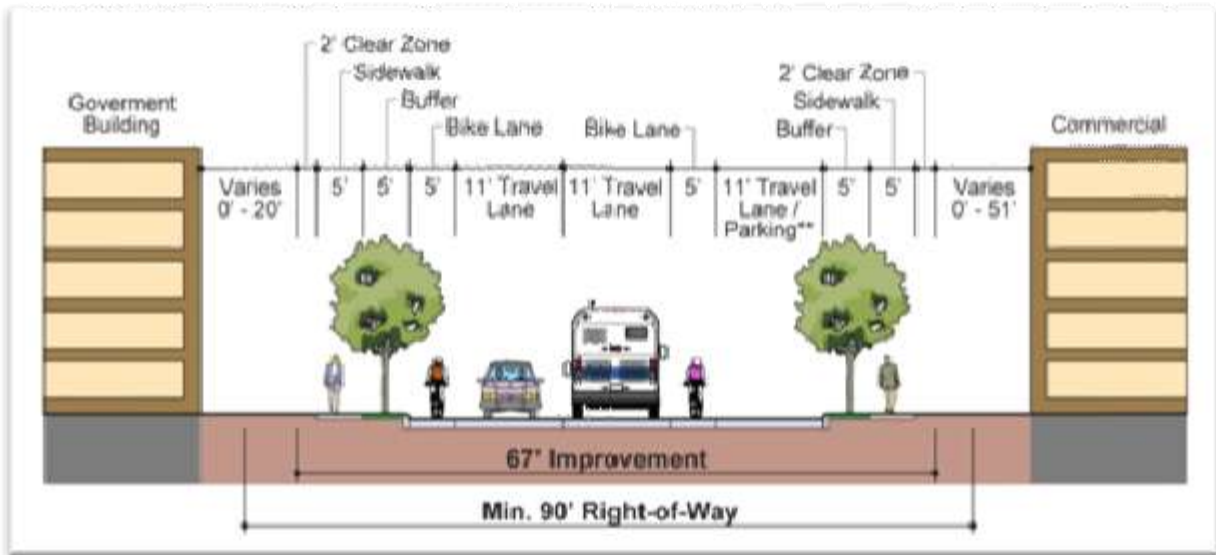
Typical Section from the Social Services Parking Garage Access to Ritchie Highway (MD 2) (Segment 3)
